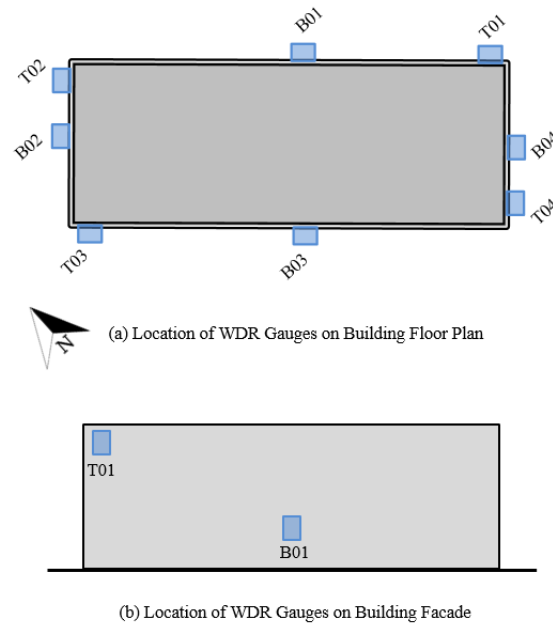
The orientation of the pilot building and locations of the WDR gauges on the building: (a) Floor plan and (b) the facade (not to scale).
